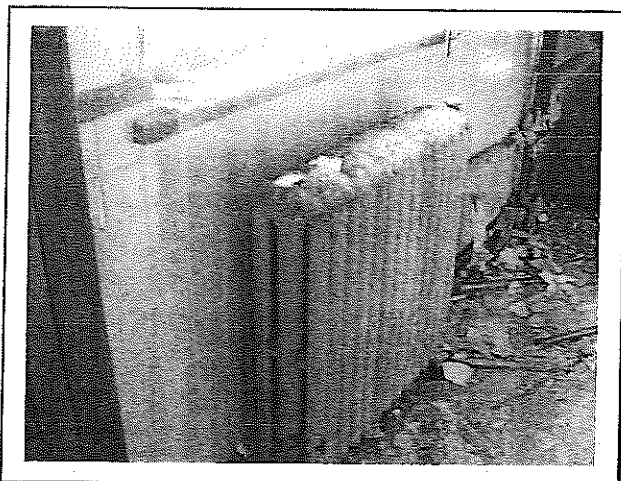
Viewing green radiator, 1st floor – Throughout.
